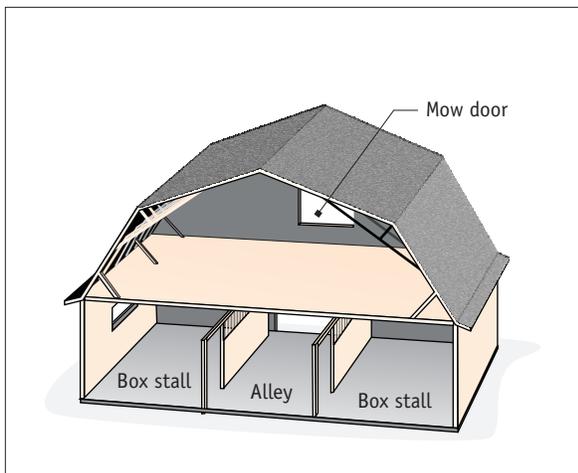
Gambrel roof. Two rows of stalls serviced from center alley (clear span, braced rafter).
